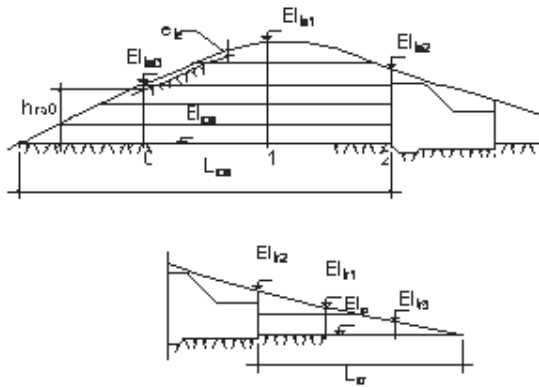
Excavation for approach and downstream channels.
